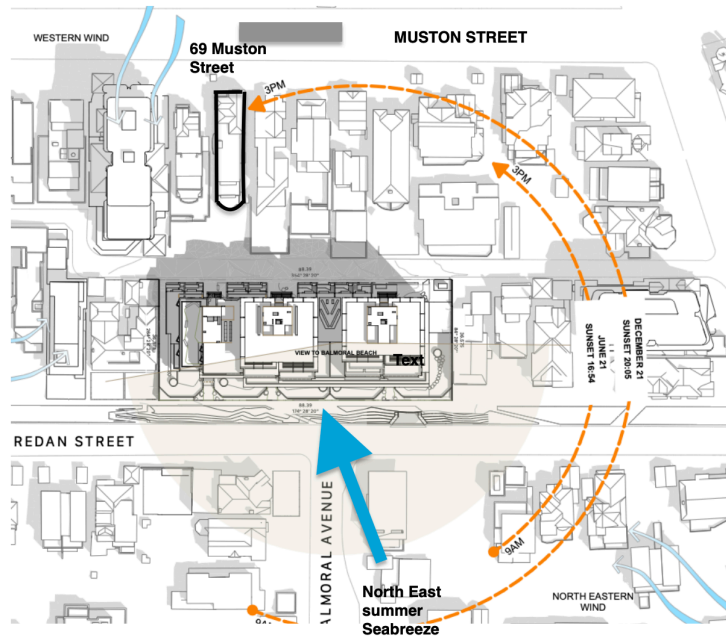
SSD Submission - Site Plan. Marked up to show direction of NE sea breeze and blocking effect on 69 Muston Street
